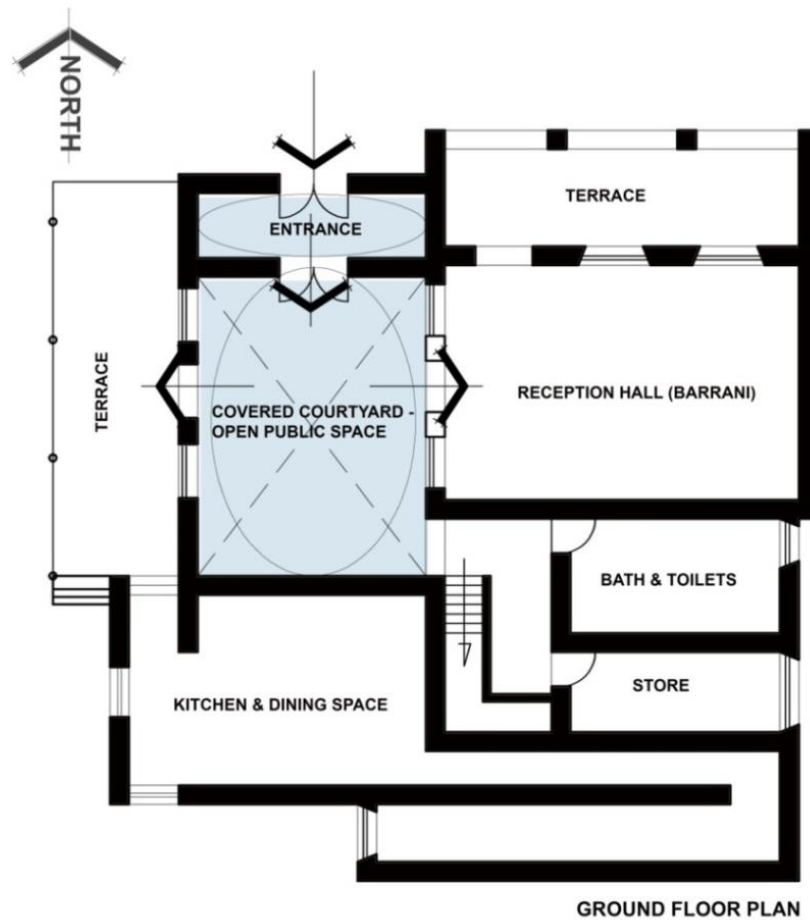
The ground floor plan of the public zone (*Diwankhana*) of *Bayt* (House) Marjan, Krad *mahalla*, Babylon.
